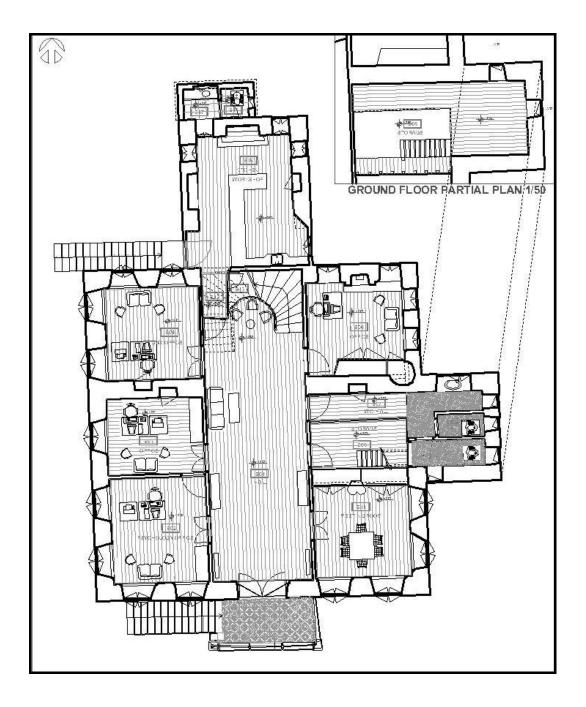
Conservation Proposal of Hasanağalar House – Entrance Floor Plan
